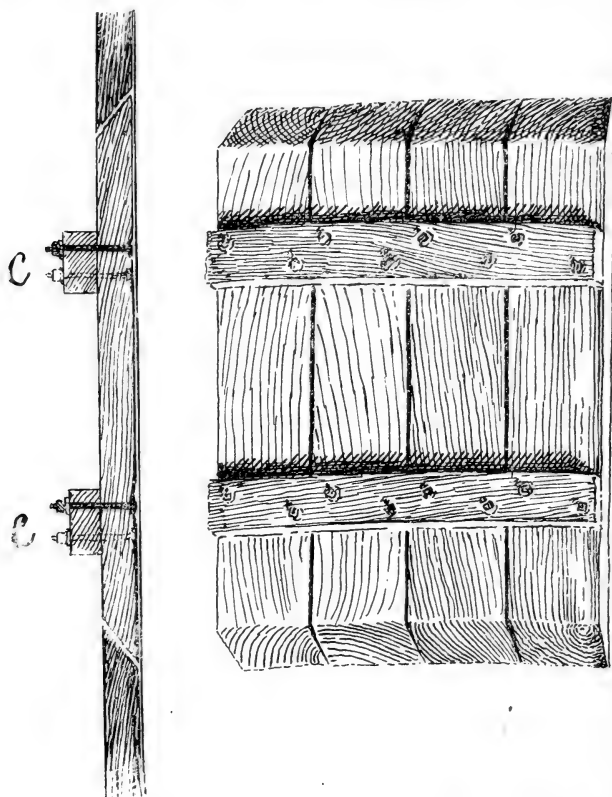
Shows appearance of door after being sawed out, and shows side view of door in place. The cleats c. c. are on outside of door.
